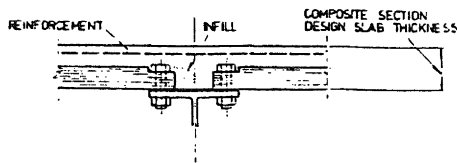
Precast Slab With Topping Bolted Directly to Beams (and with Continuity Reinforcement).
